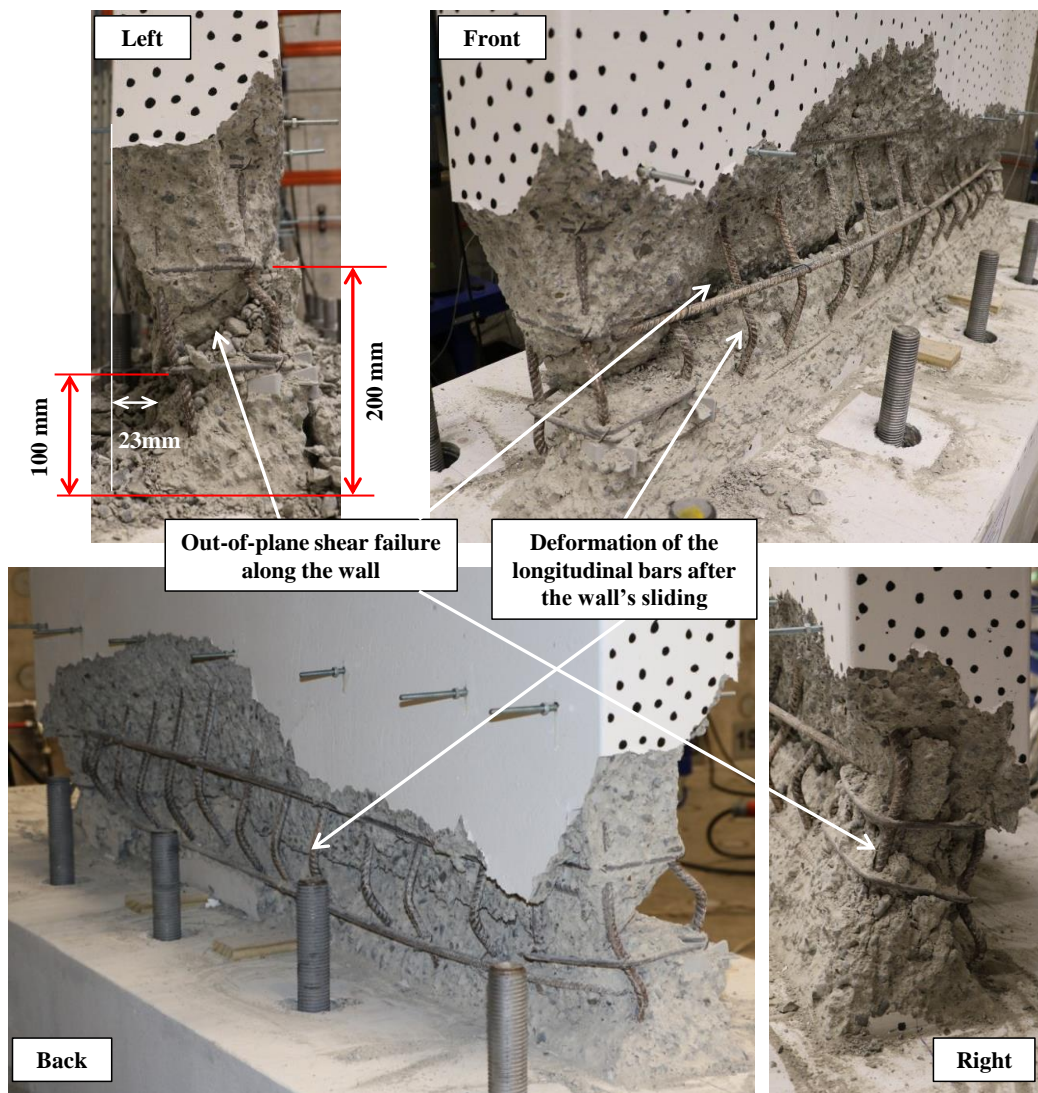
SP2-ND failure mode after removing the concrete spalling pieces
